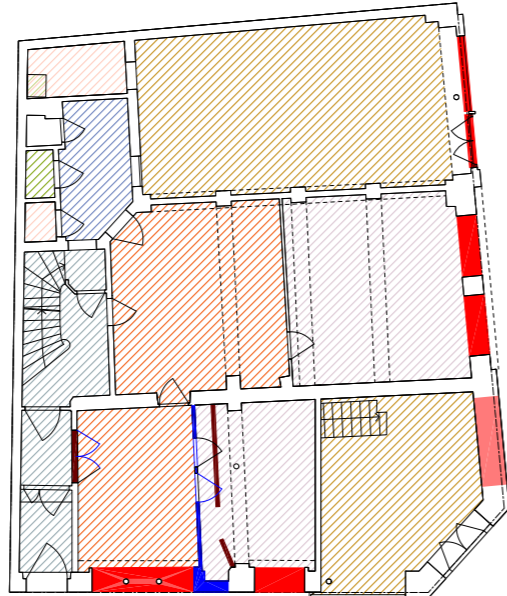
2023 Plan showing existing building with planned demolitions marked in red. Part of a document "Permis de Demolir" (Permit to Demolish).
